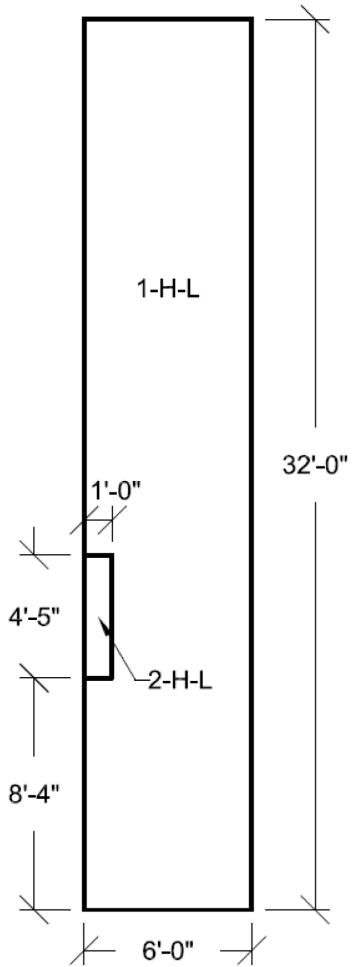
H.6-151 DGFOV Slab 3 Looking Down
